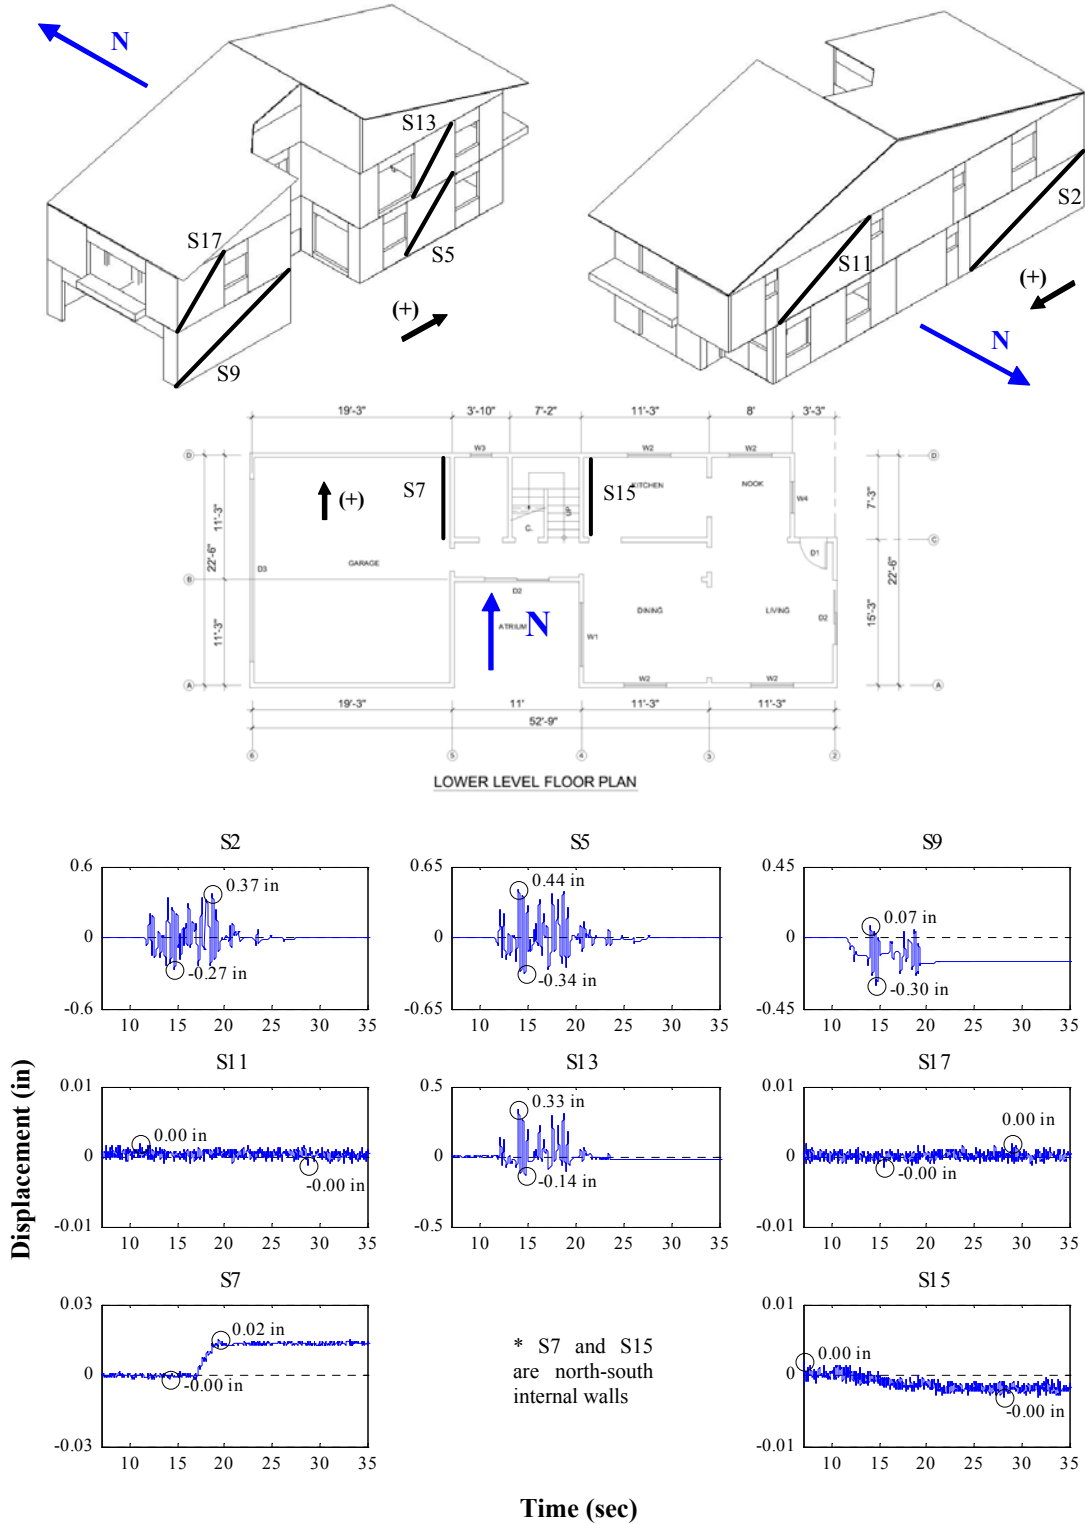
Wall deformations of east-west internal walls for Test NWP2S14
